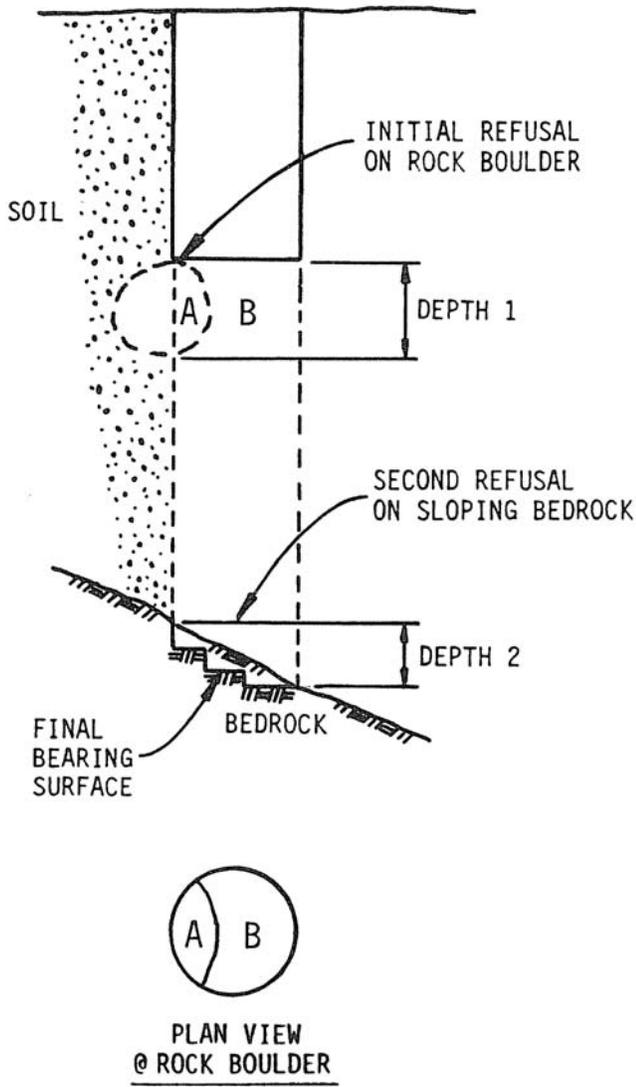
Typical drilling in Piedmont soils and rock (Schwartz 1987).
